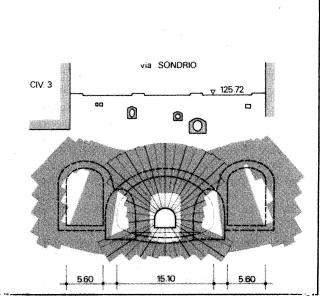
Treatment from surface, to protect two lateral adits, followed by treatment from central pilot to allow excavation of main central tunnel. Milano Metro
